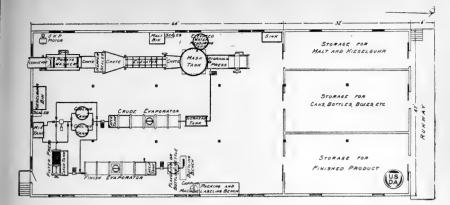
Arrangement of equipment in proposed sweet-potato sirup plant.
